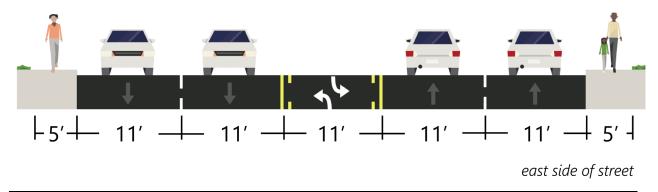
Typical Cross Section, Segment 1: SE McGillivray to Mill Plain Boulevard (looking north)
